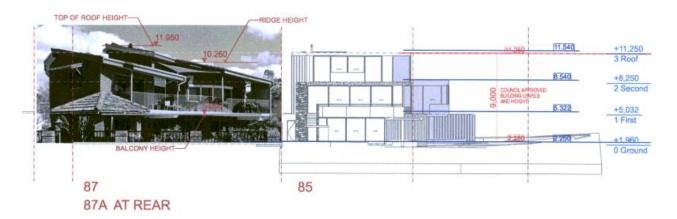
The Esplanade Street Elevation including 87 The Esplanade Street – Specifying Building Height Relative Levels (the blue line indicates the new proposed building height)
